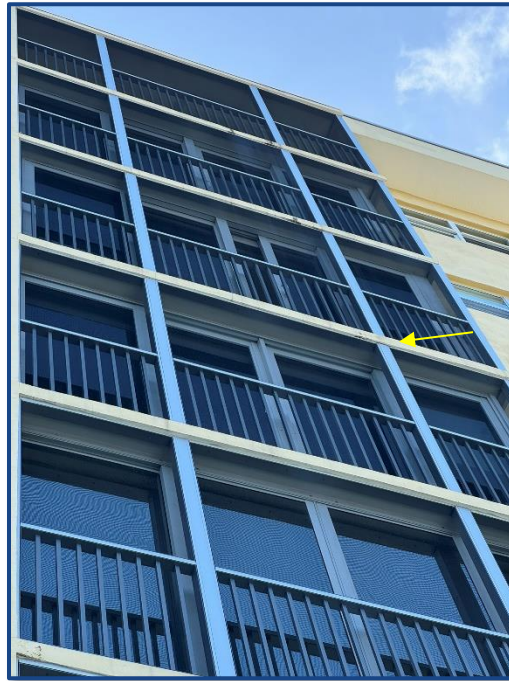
Edge cracking observed at X01/X02 riser.
